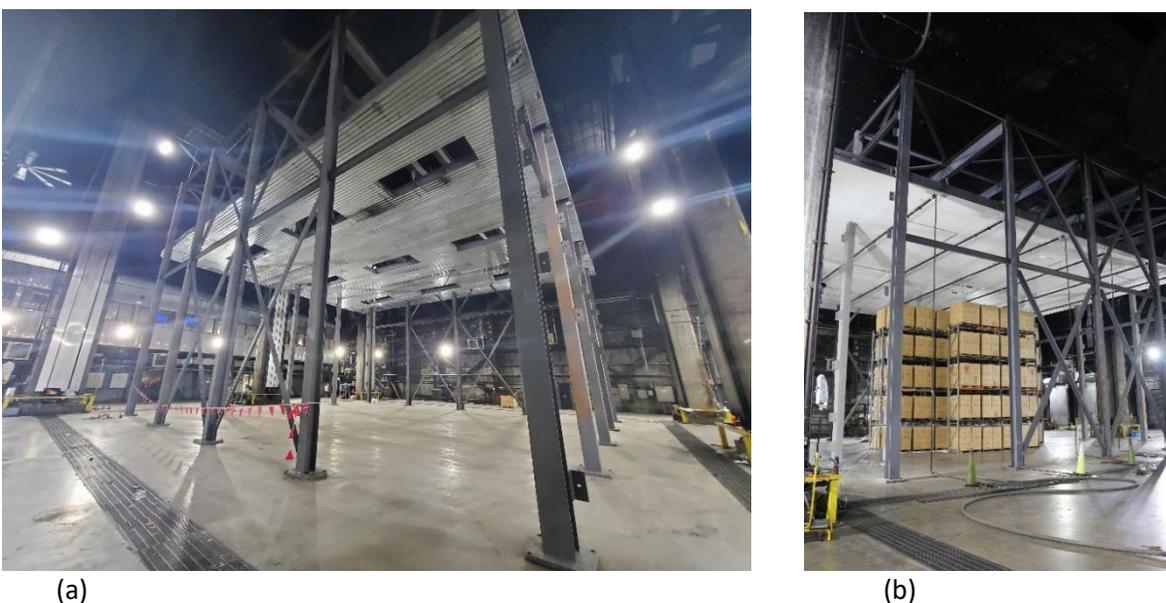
Pictures of the ceiling structure: (a) skeleton of the steel structure and (b) Test setup under the ceiling structure.
